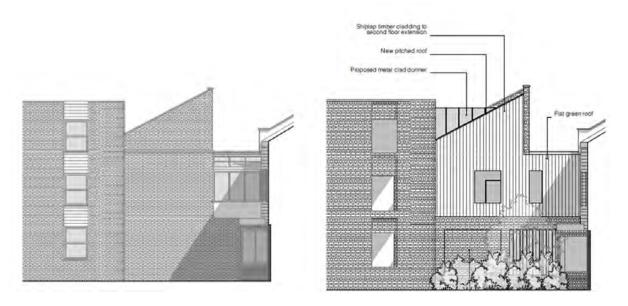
Existing (left) and Proposed (right) South-Western Elevation
